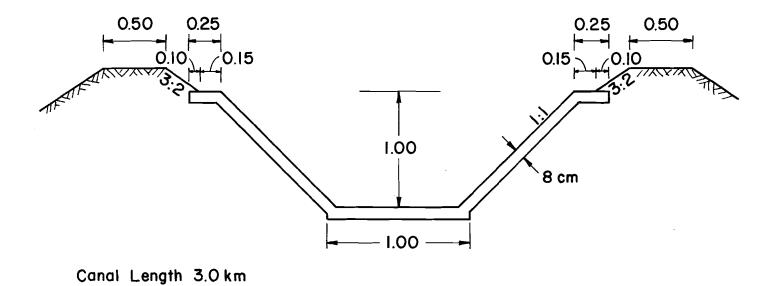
Beni Magdul Canal: Typical Finished Cross-Section.
